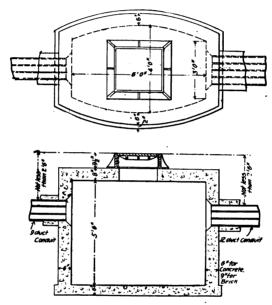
Vault Size 5 to be Used on Runs of 9 to 12 Ducts of Conduit when not Intersected.
